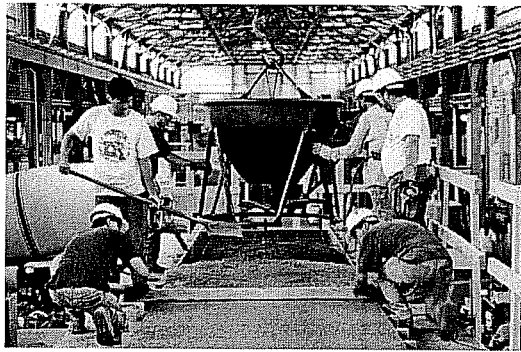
Placement, Vibration and Screeding of Deck Concrete
